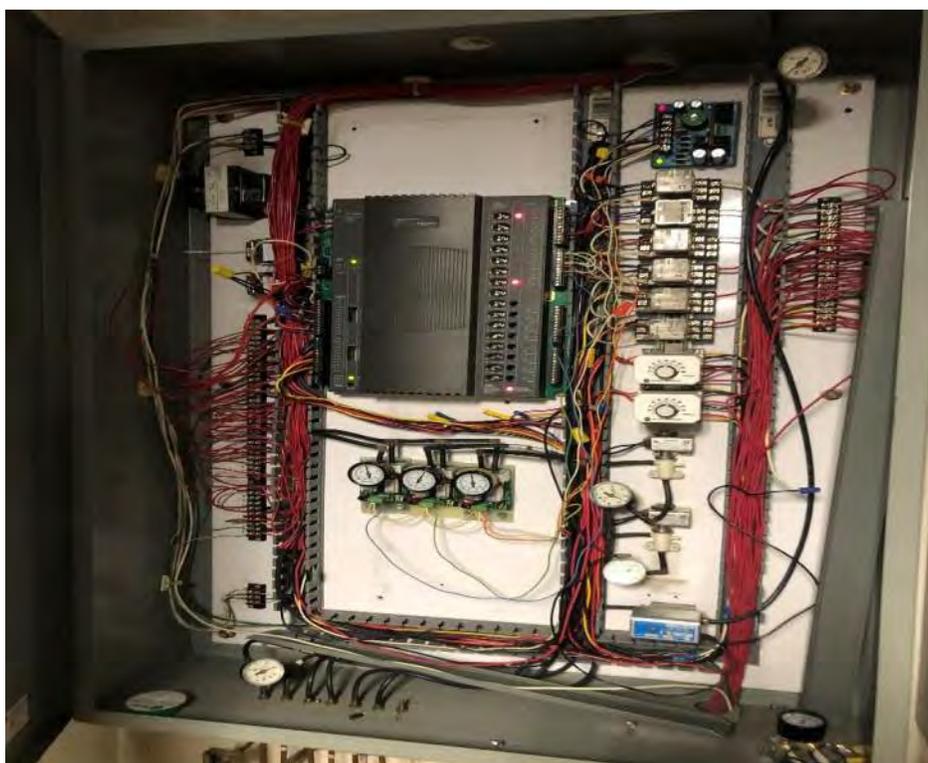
View of non-suspect wire insulation and metal backer board in basement room B-19. Photo taken December 23, 2020.
